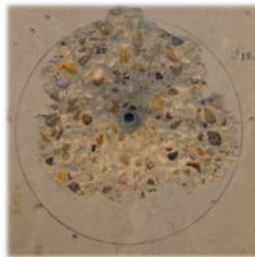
Benchmark specimen failure mode (HB16-100-8.8-C40)
